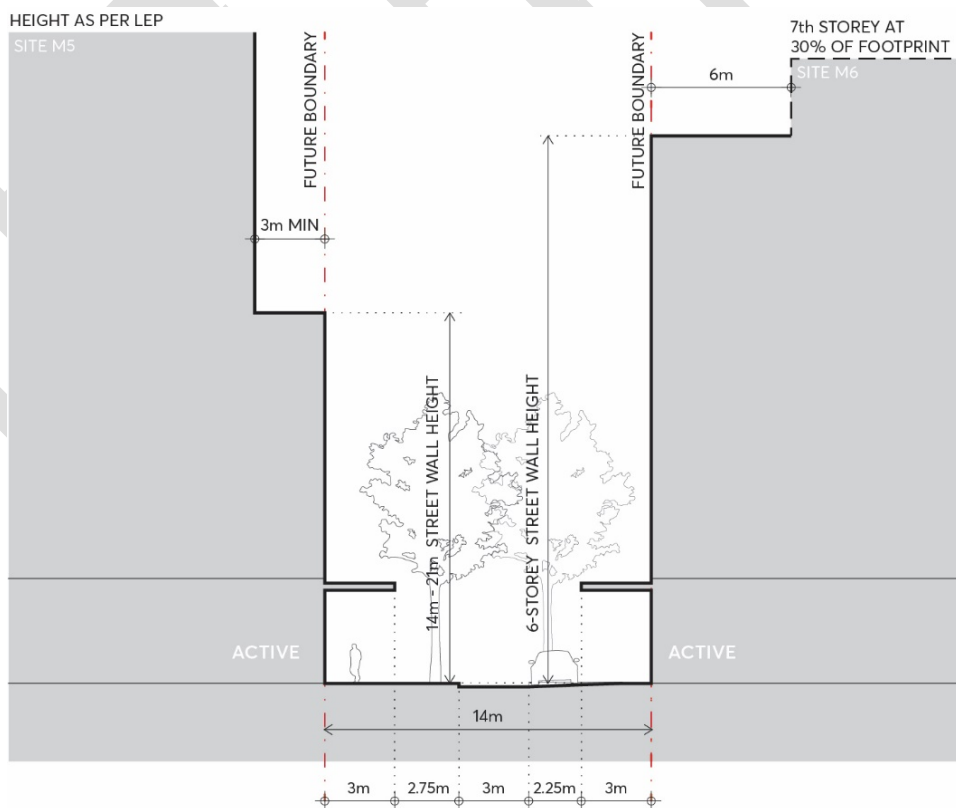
Future Horwood Place (Section C) Setbacks & Street Wall Height
